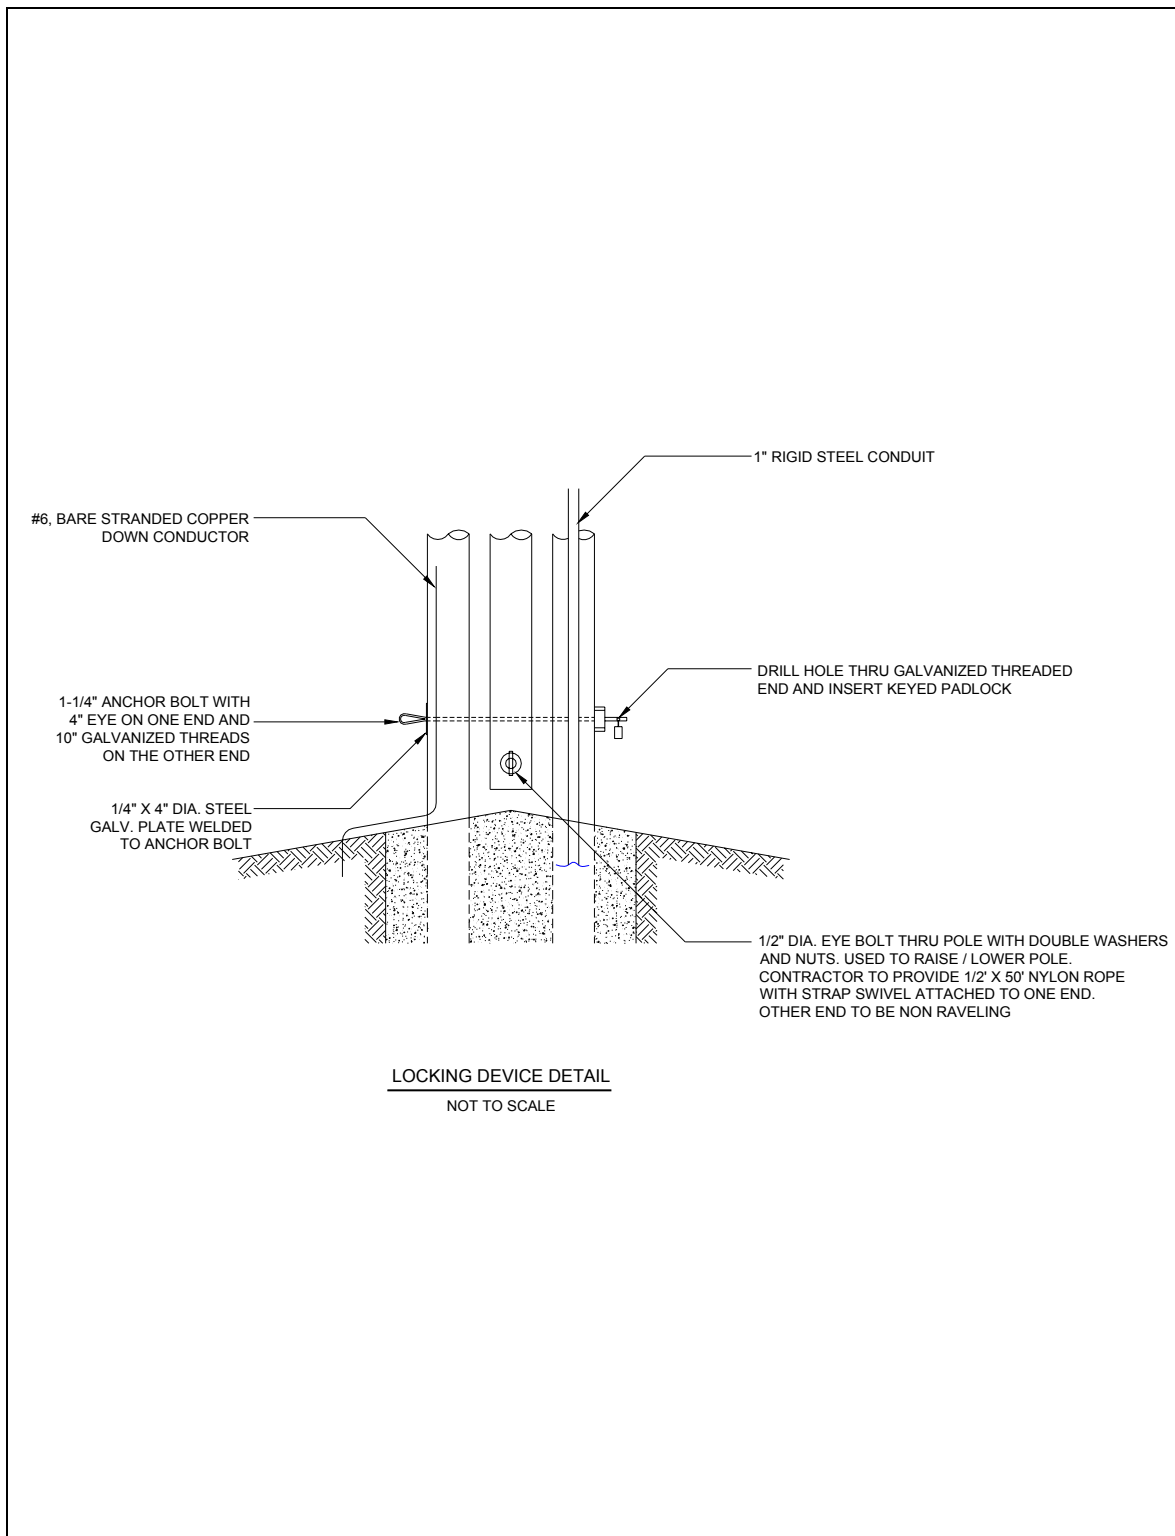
Standard Details for Pivoting Rotating Beacon Pole – GL-600 Sheet 4B – Locking Device Detail
